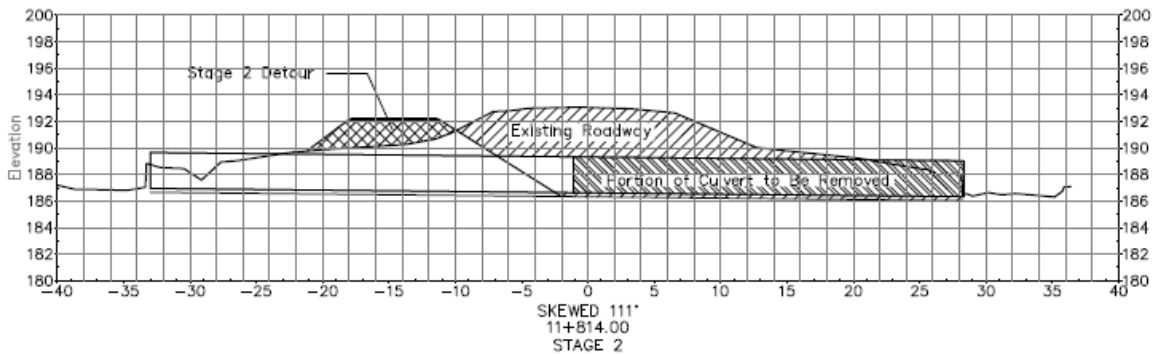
Staged construction for the replacement of culvert at Station 11+814, Stage 2
